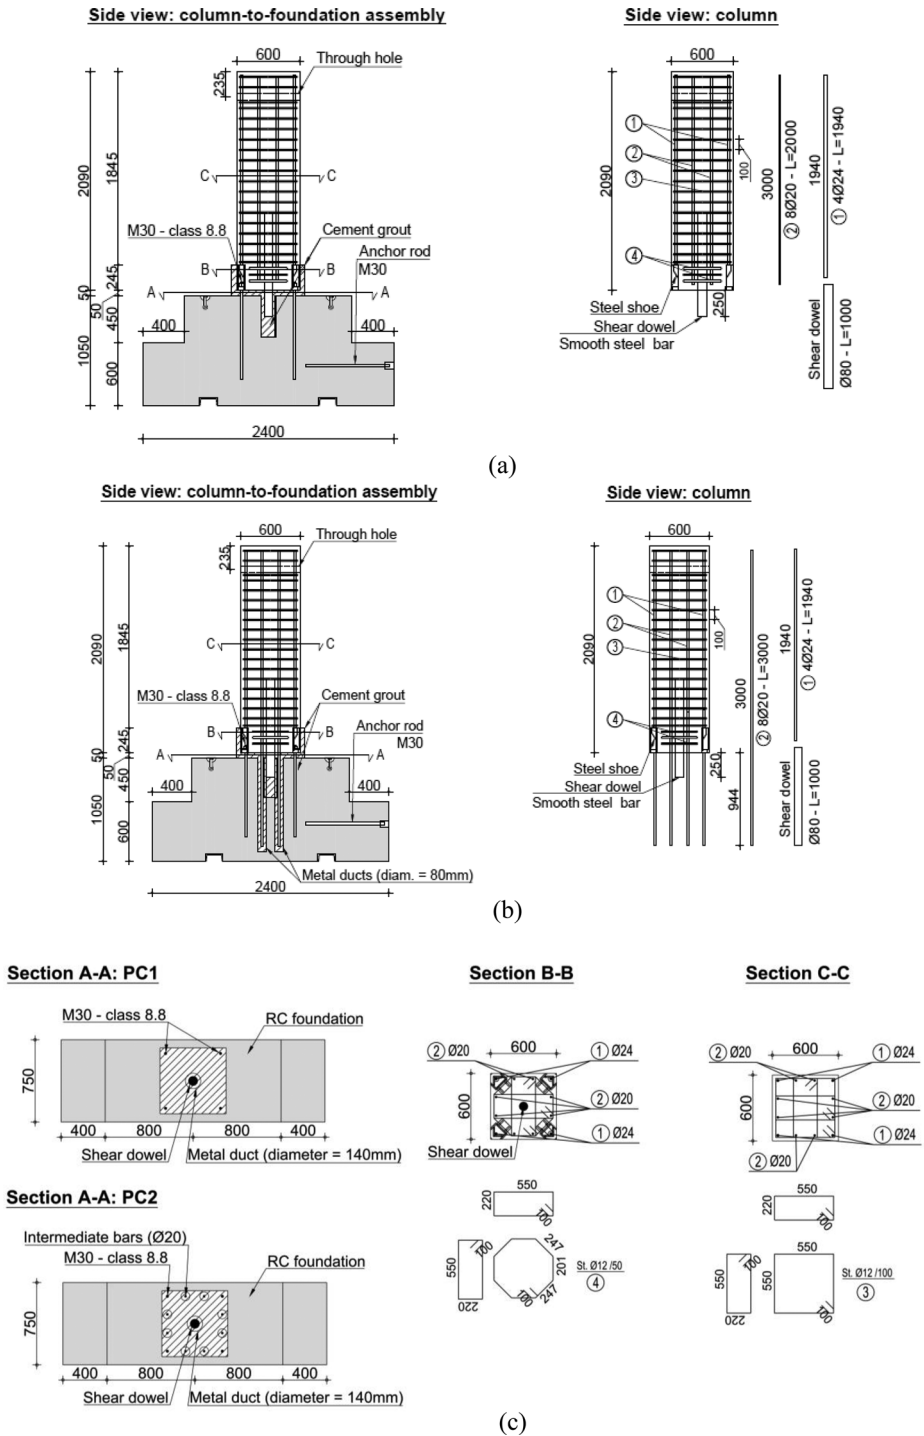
Geometry and reinforcement details of the specimen (a) PC1; (b) PC2; (c) cross-section of both specimens. (dimensions in [mm])
